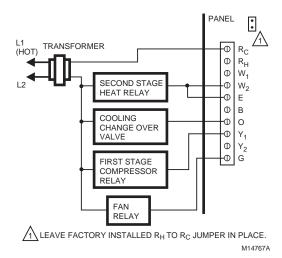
Single-stage heat pump with auxiliary heat wiring diagram.
